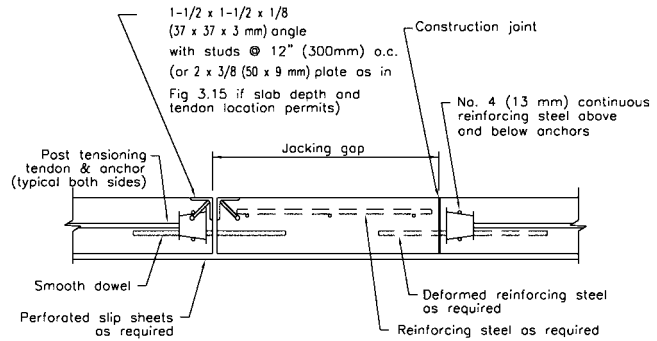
Typical doweled joint detail for post-tensioned slab.
